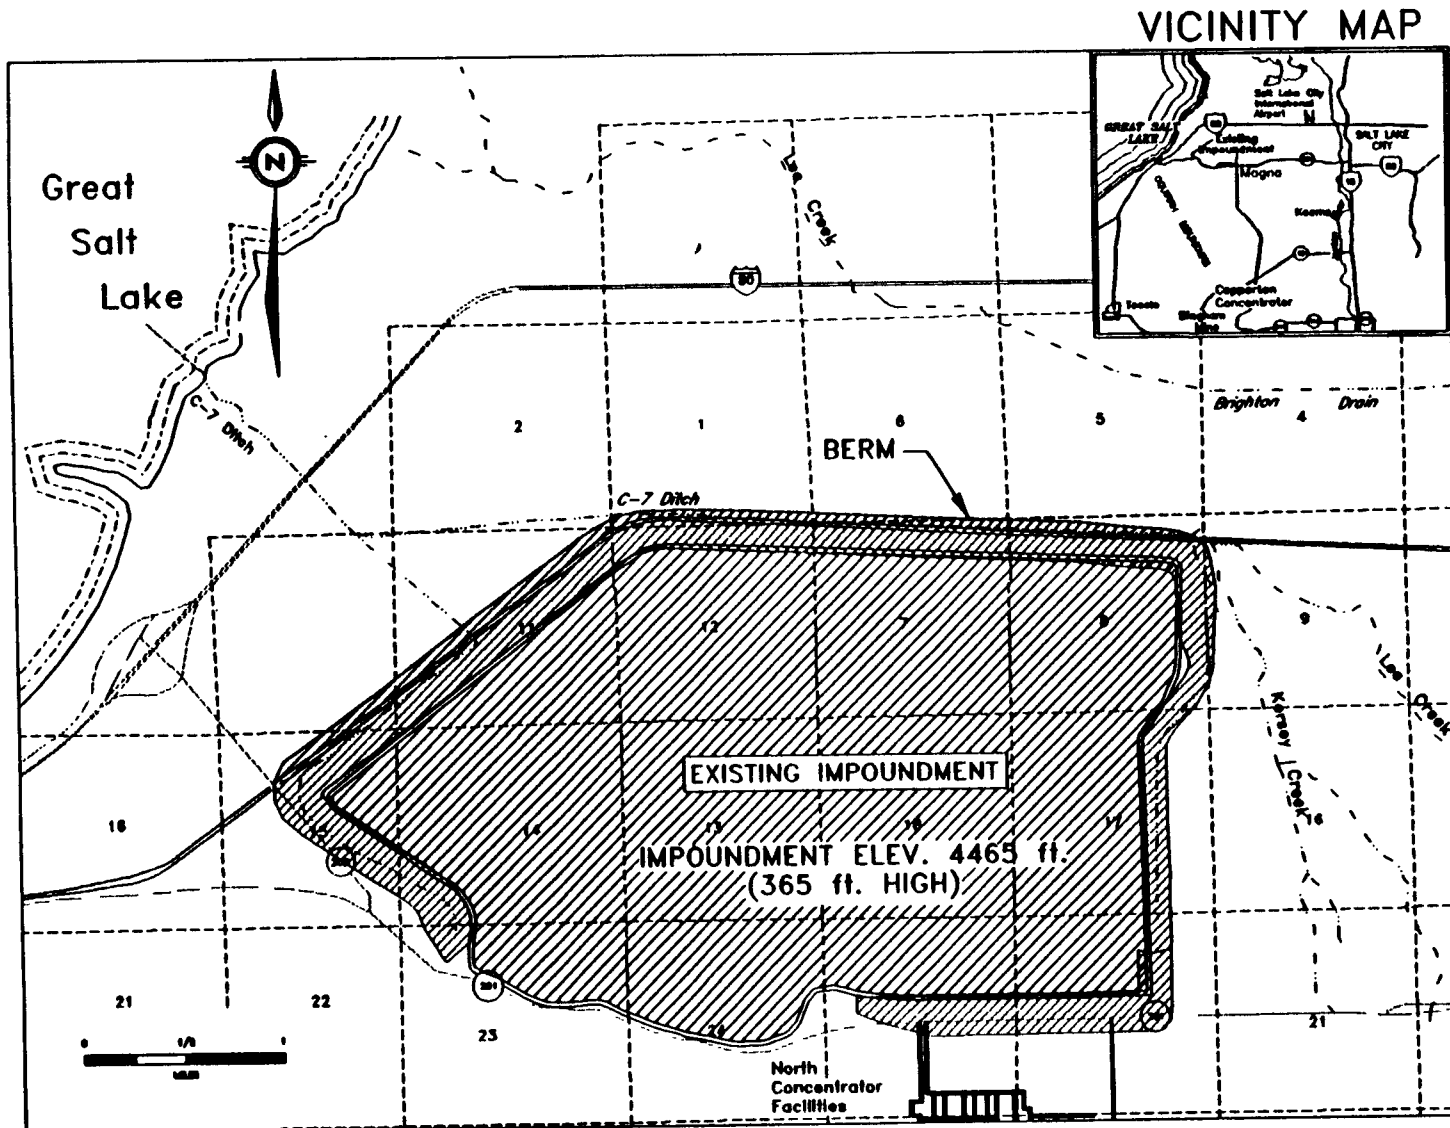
ON-SITE ALTERNATIVE 2: Continue Raising Existing Impoundment, Construct Berm Around Impoundment
